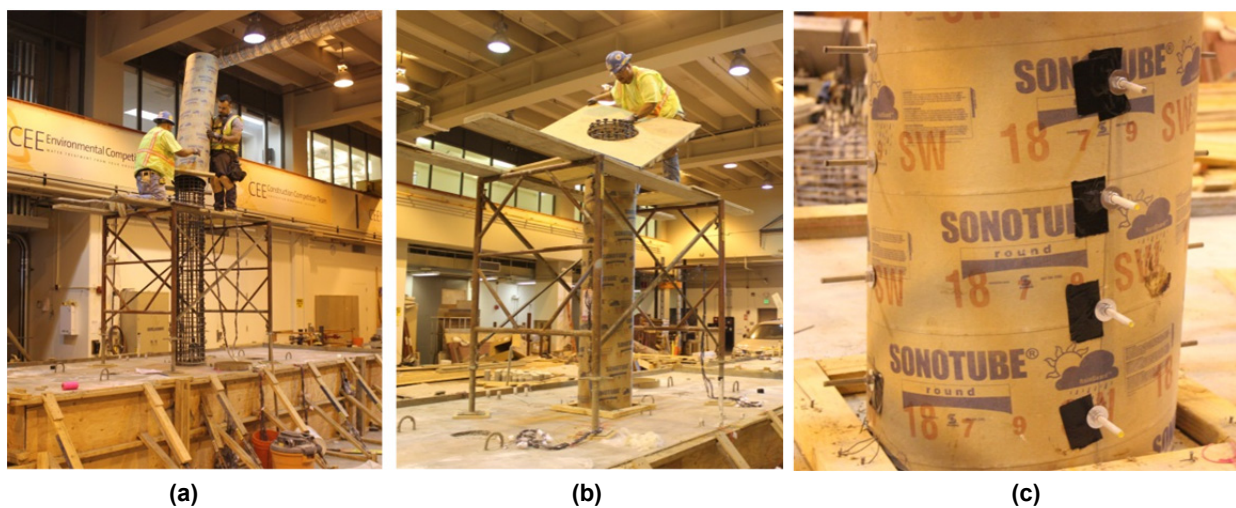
(a) Installing the column sonotube; (b) building the column head scaffolding; and (c) inserting instrumentation rods into the column formwork.
